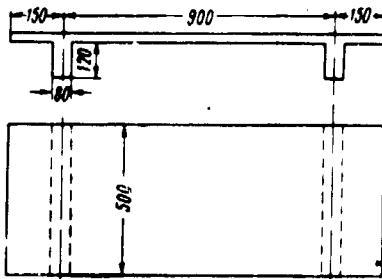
Design of Reinforced Concrete Plates During Impact Tests.
